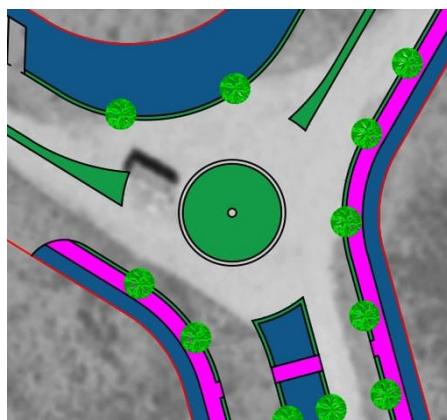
Roundabout at intersections of Bulevar patrijarha Pavla and streets Momčila Gavrića and Planirana 12
